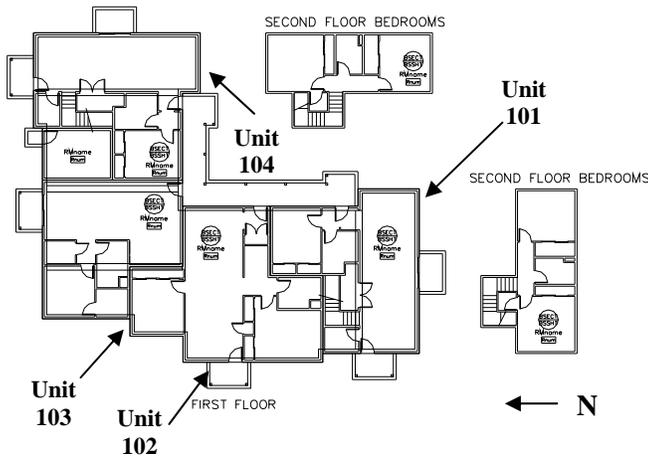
FLOOR PLAN FOR BUILDING F-1
